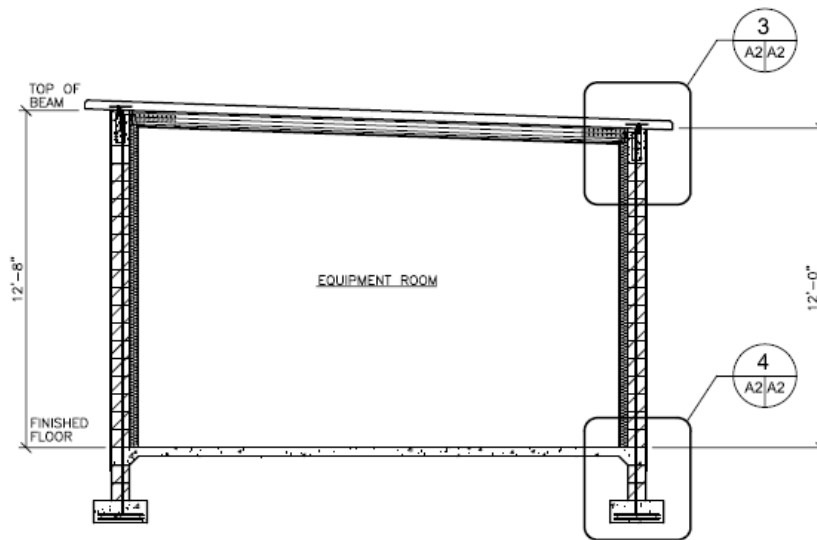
TYPICAL EQUIPMENT BUILDING LAYOUT - SIDE END ELEVATIONS
